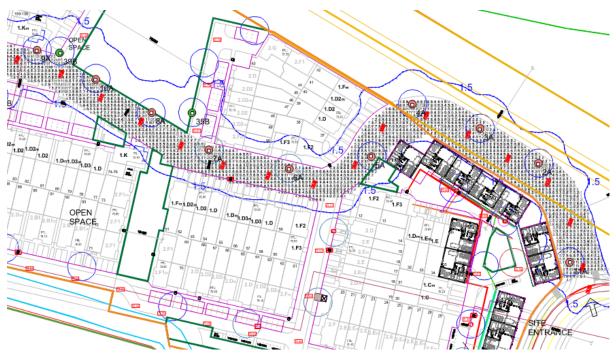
Illumination levels at entrance road to site (Lighting Reality Hollystown 2&3)
